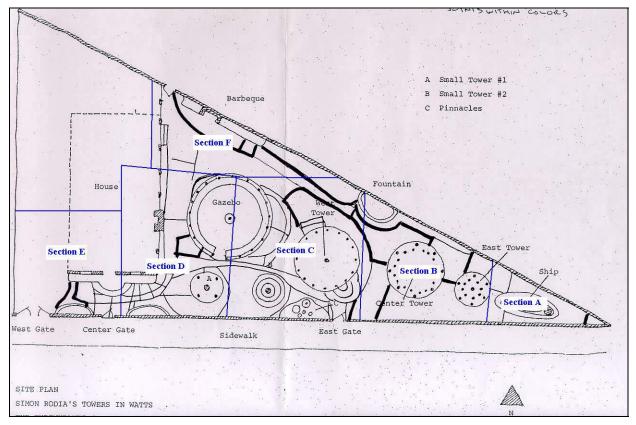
Plan drawing of Rodia's Towers showing detail sections.
